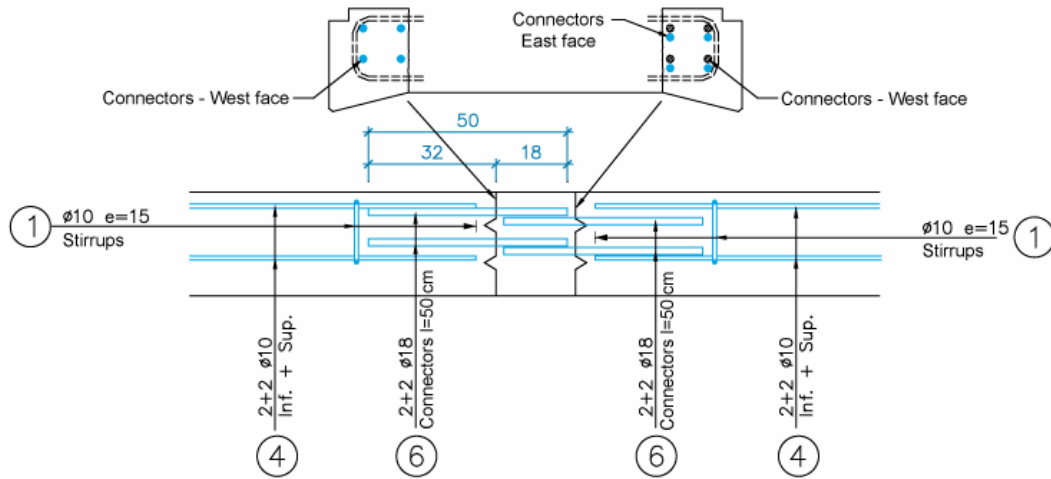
Connection of prefabricated UHPFRC kerb segments, reinforcement
